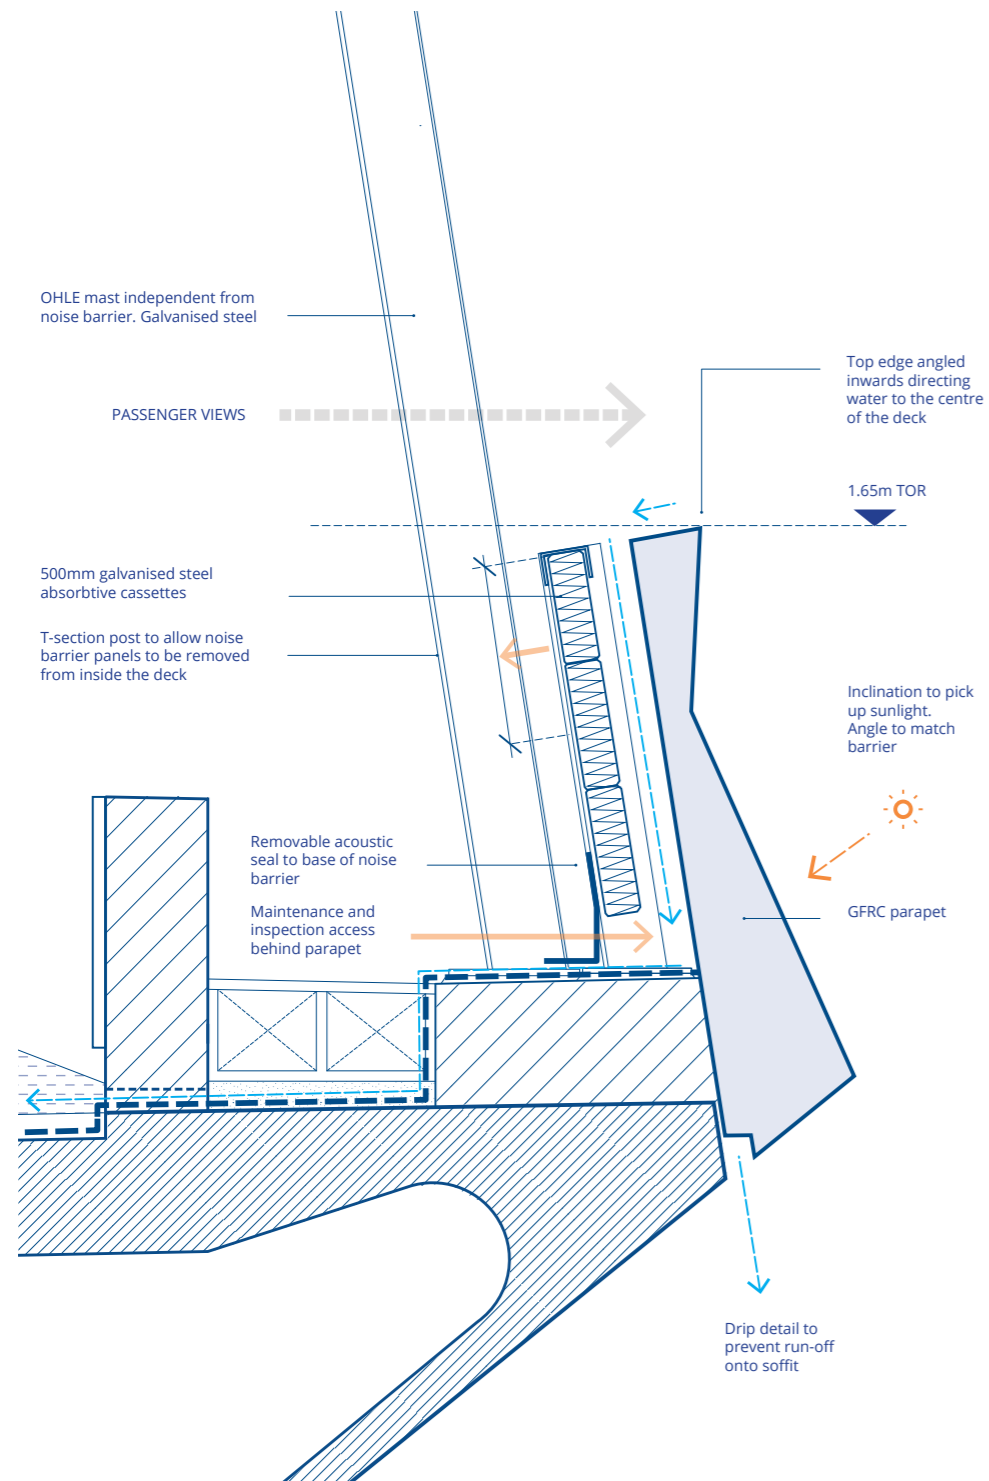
\_ Detail section - 4m hybrid noise barrier
